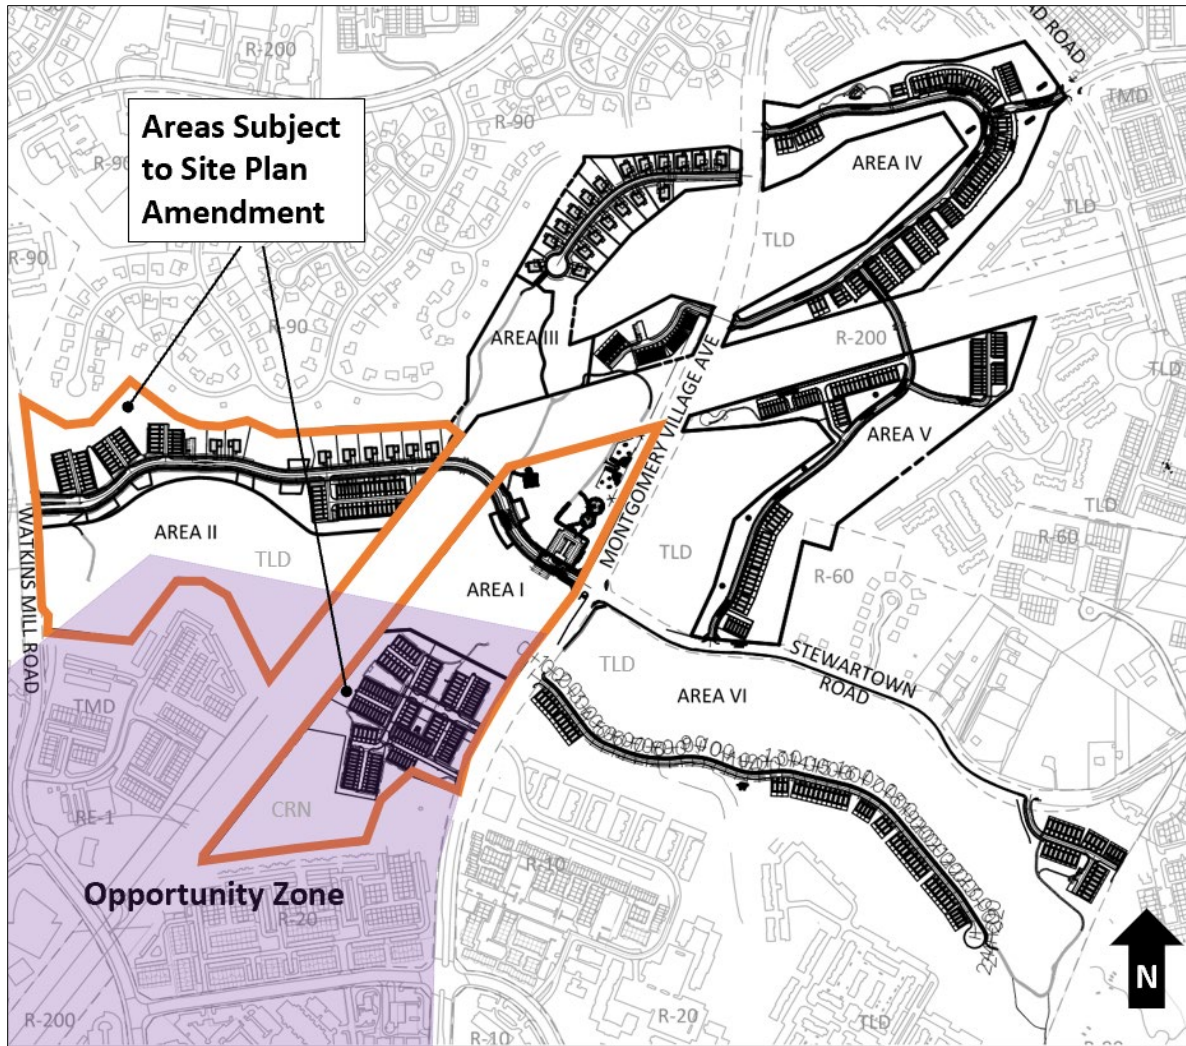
Portion of the Site Plan Subject to this Amendment (Areas I and II)
